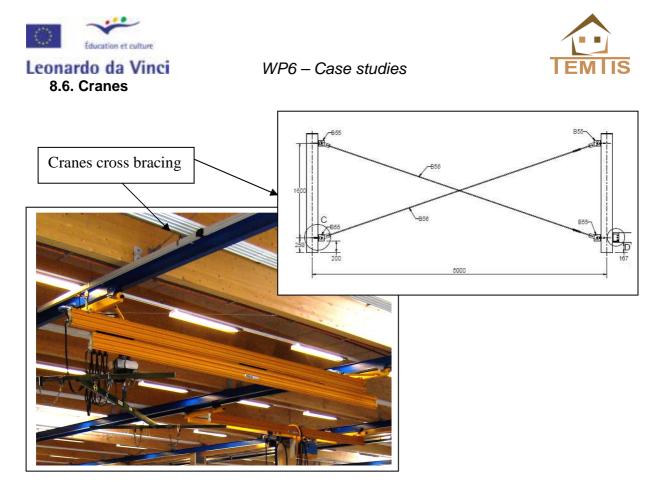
Cranes and the drawing of the cross bracing to the roof.
